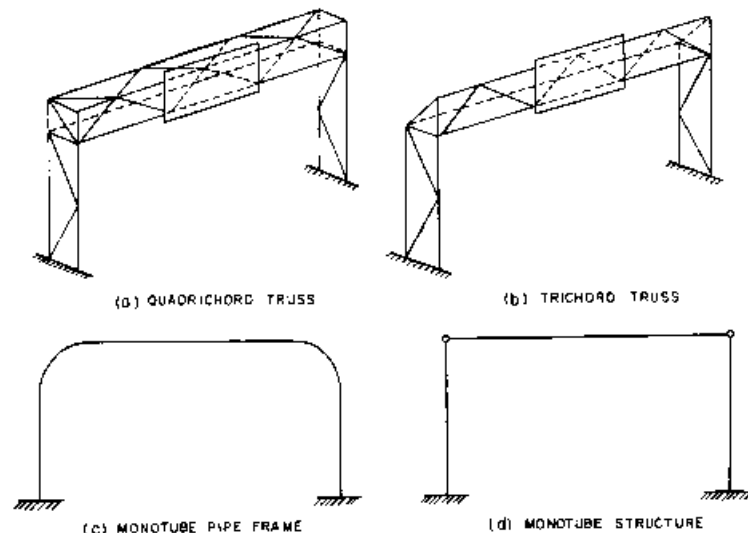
Configuration of Commonly Used Span-Type Sign Support Structures
